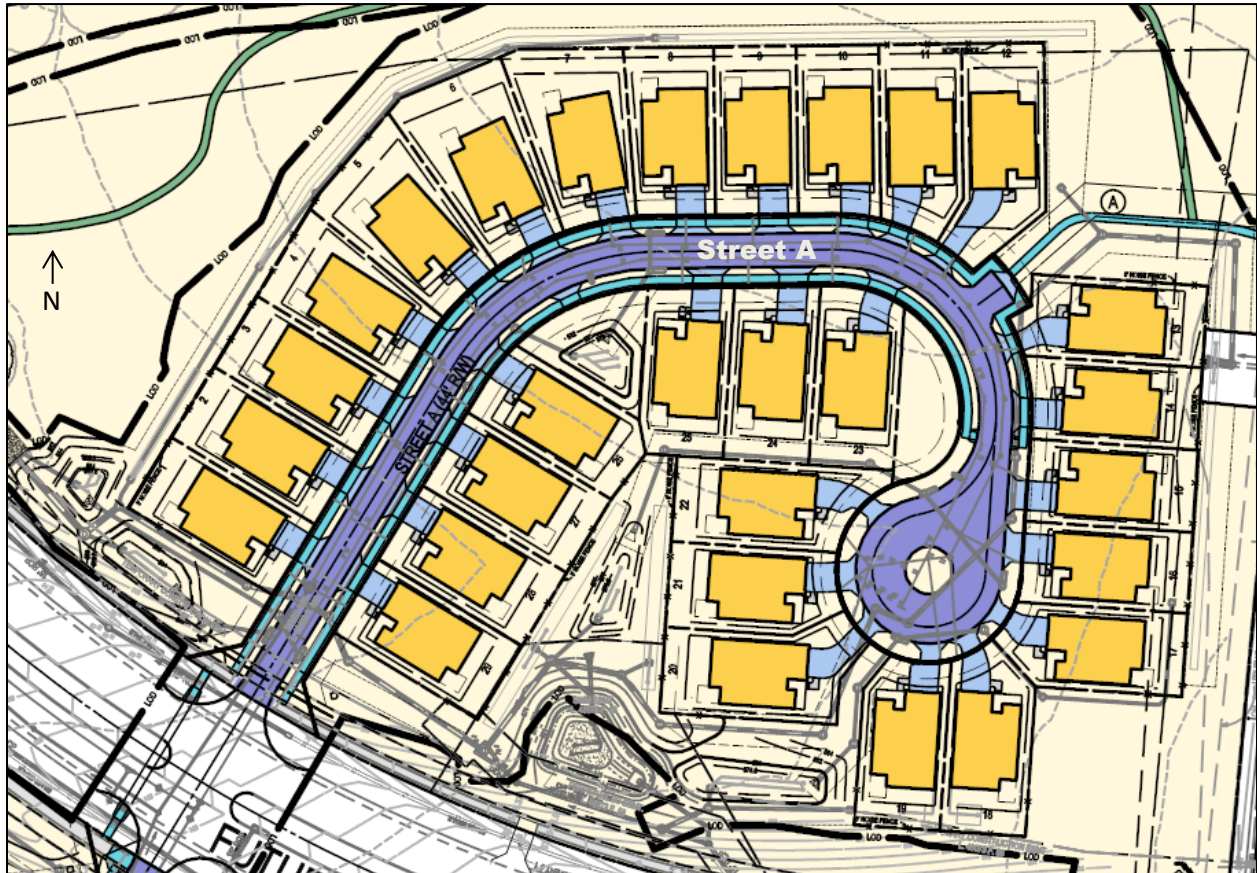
Over-length cul-de-sac at Street A and sidewalk treatment at cul-de-sac bulb.
